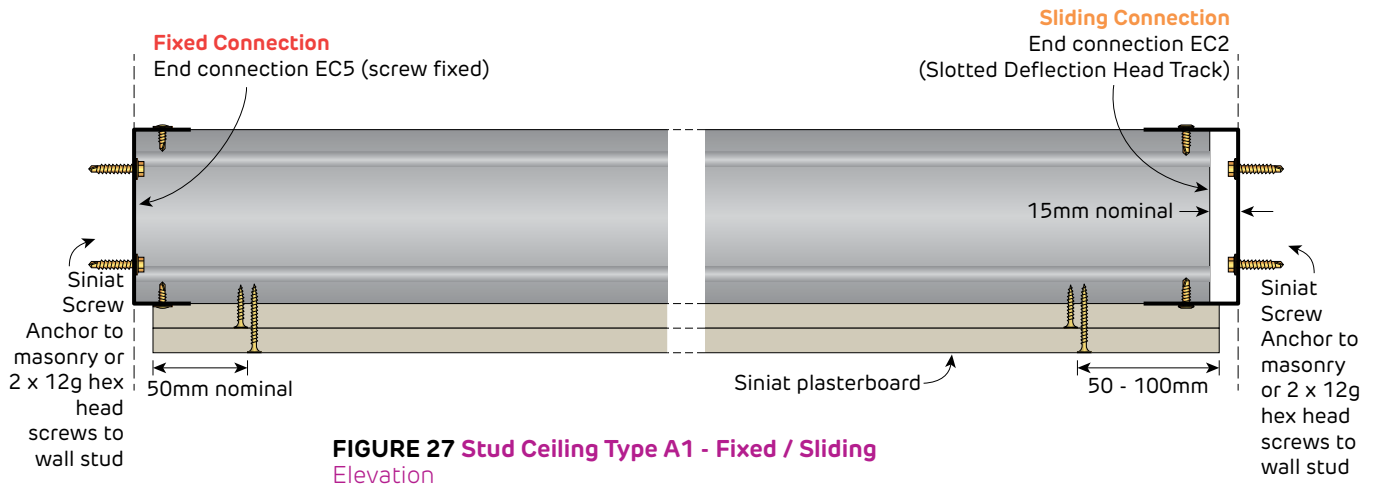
Stud Ceiling Type A1 - Fixed / Sliding
